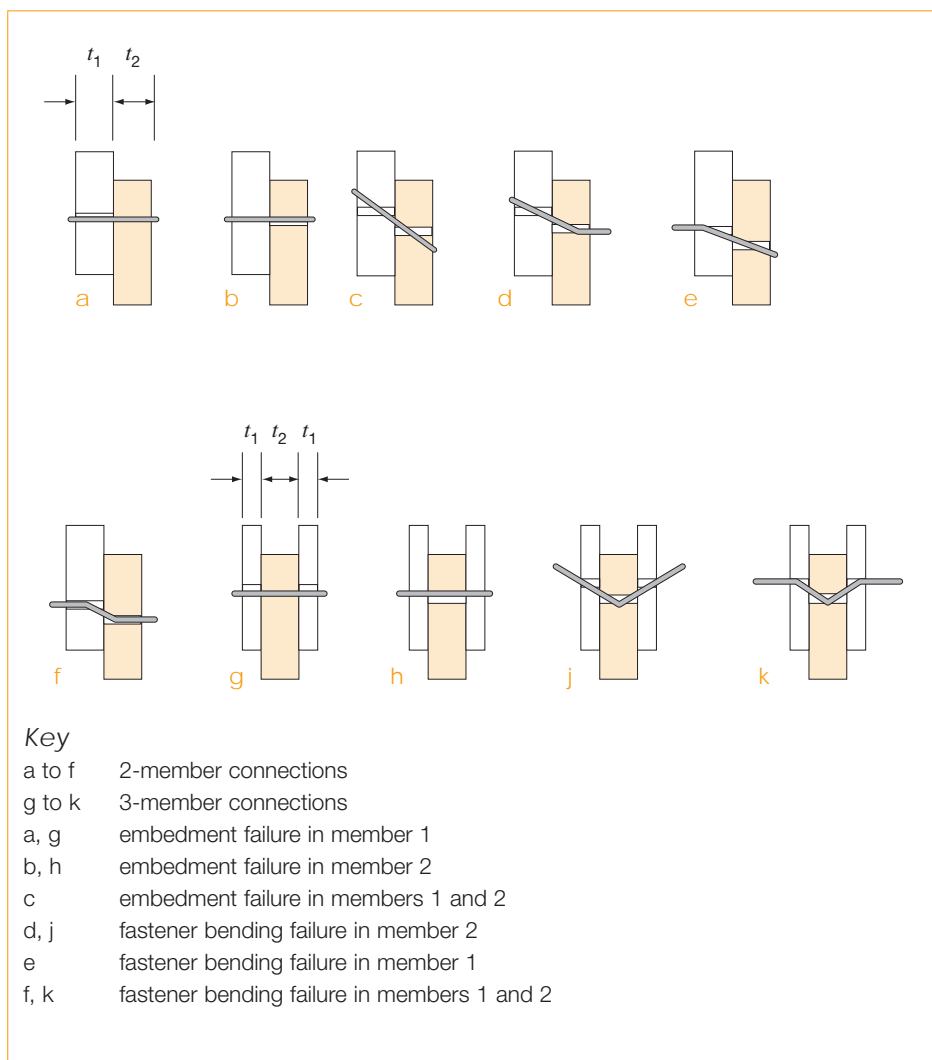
Principal failure modes for laterally-loaded dowel type connections between timber or wood-based panels
